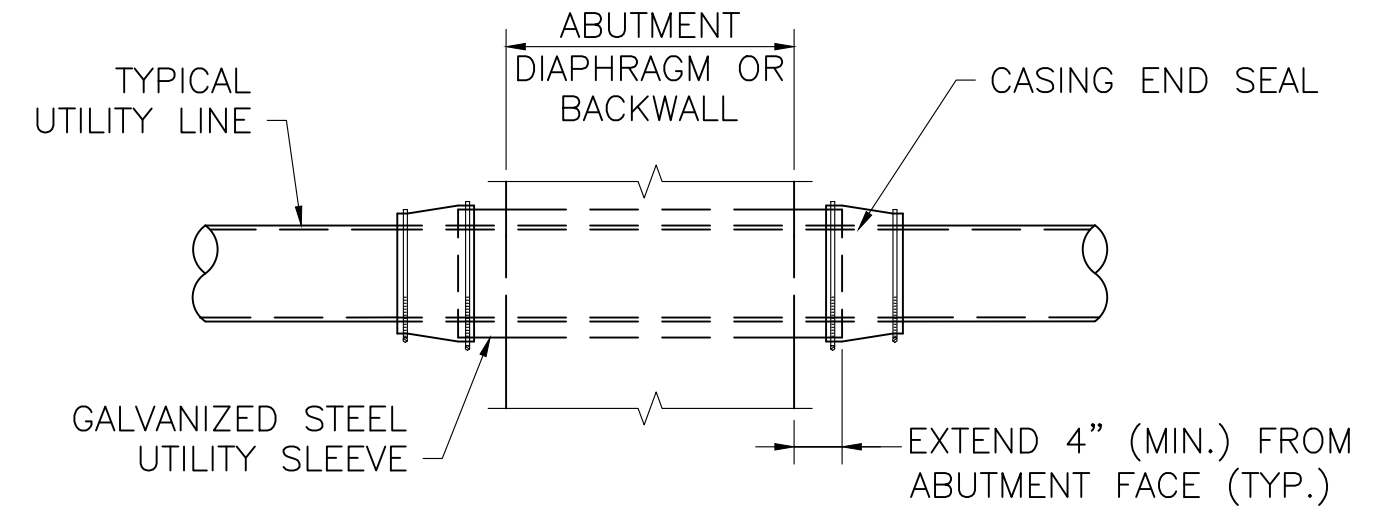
DETAILS AT ABUTMENT UTILITY BAY AT ROADWAY SECTION
